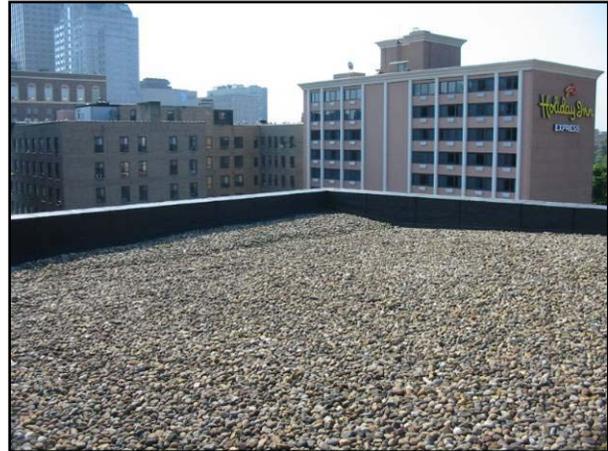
Water Path from Southeast Corner of Great Hall to Roof Drain at East Edge (extreme right of photo)
